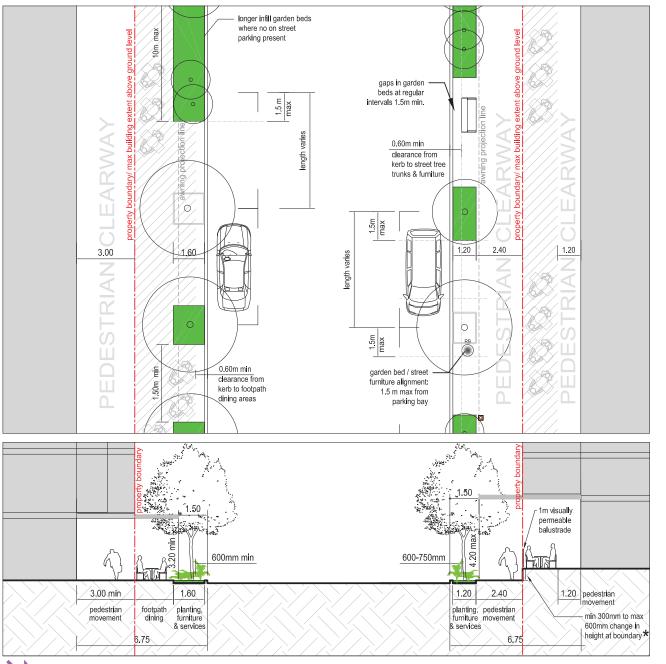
Railway Terrace flood affected land - Streetscape setout detail
